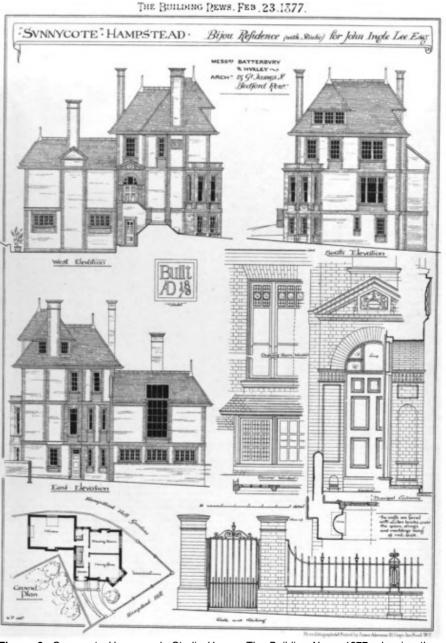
Sunnycote House and Studio House, The Building News 1877: showing the Studio House without balconies and rear annex.
